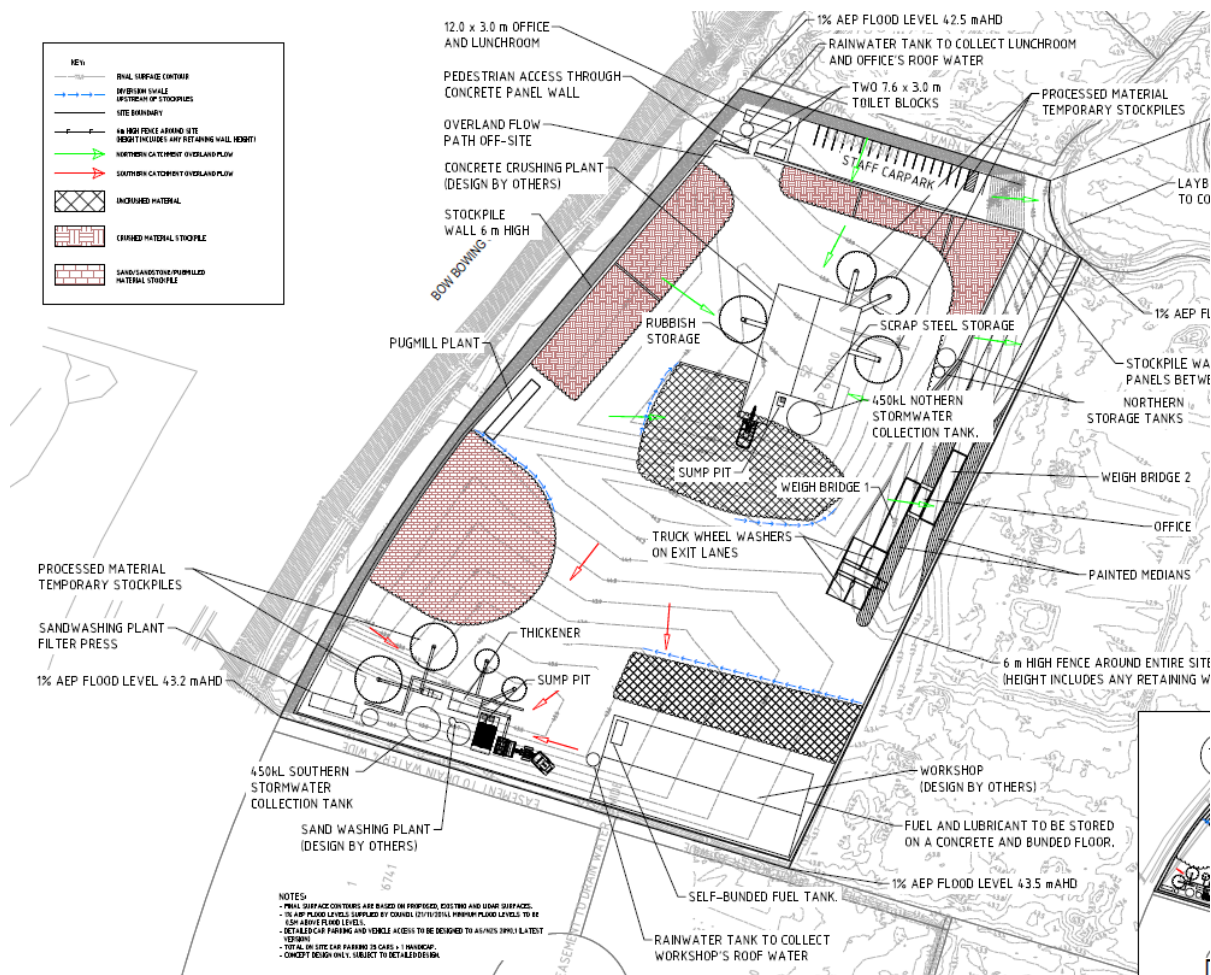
General Site Layout. 7 Montore Road, Minto NSW (North to the top of page)
